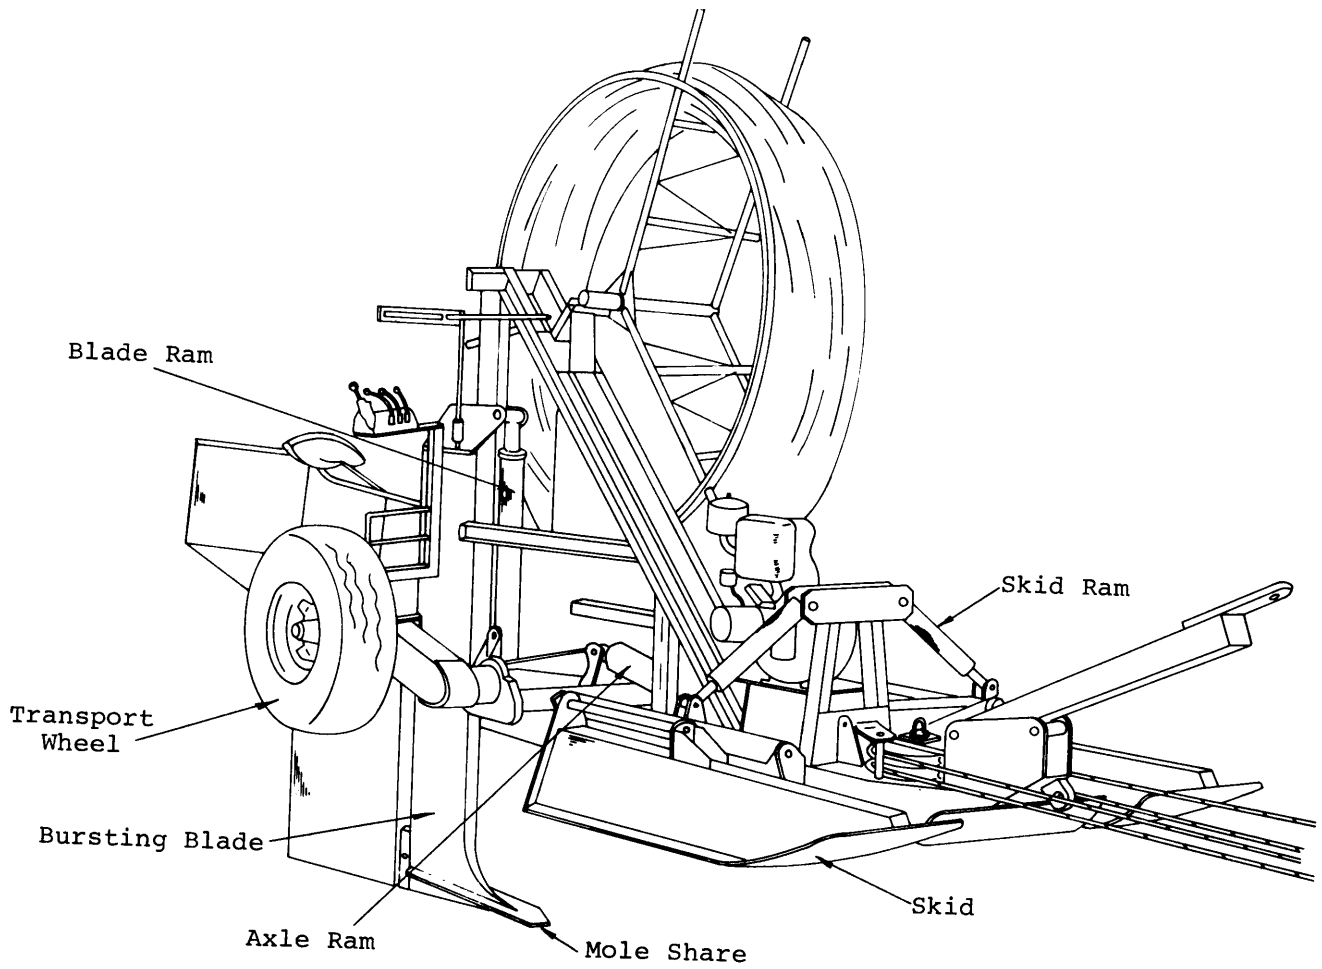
The TG1 Trenchless Drainlayer (winch not shown)
